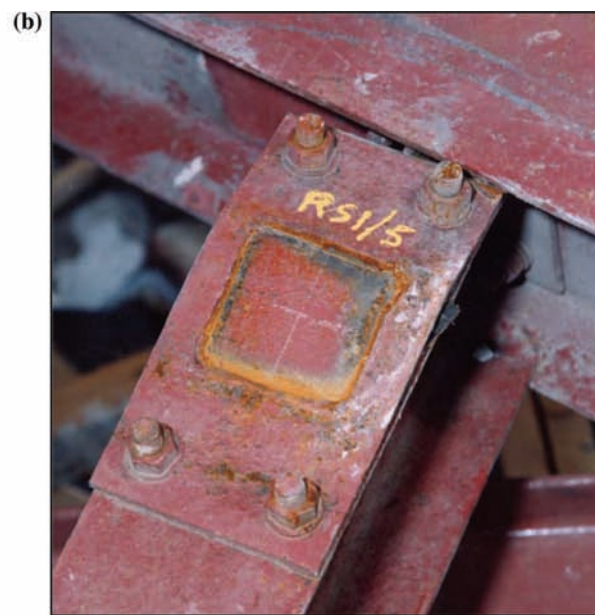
(a,b) Showing the damaged steel I section structure with characteristic detachment of supporting leg, bottom right
